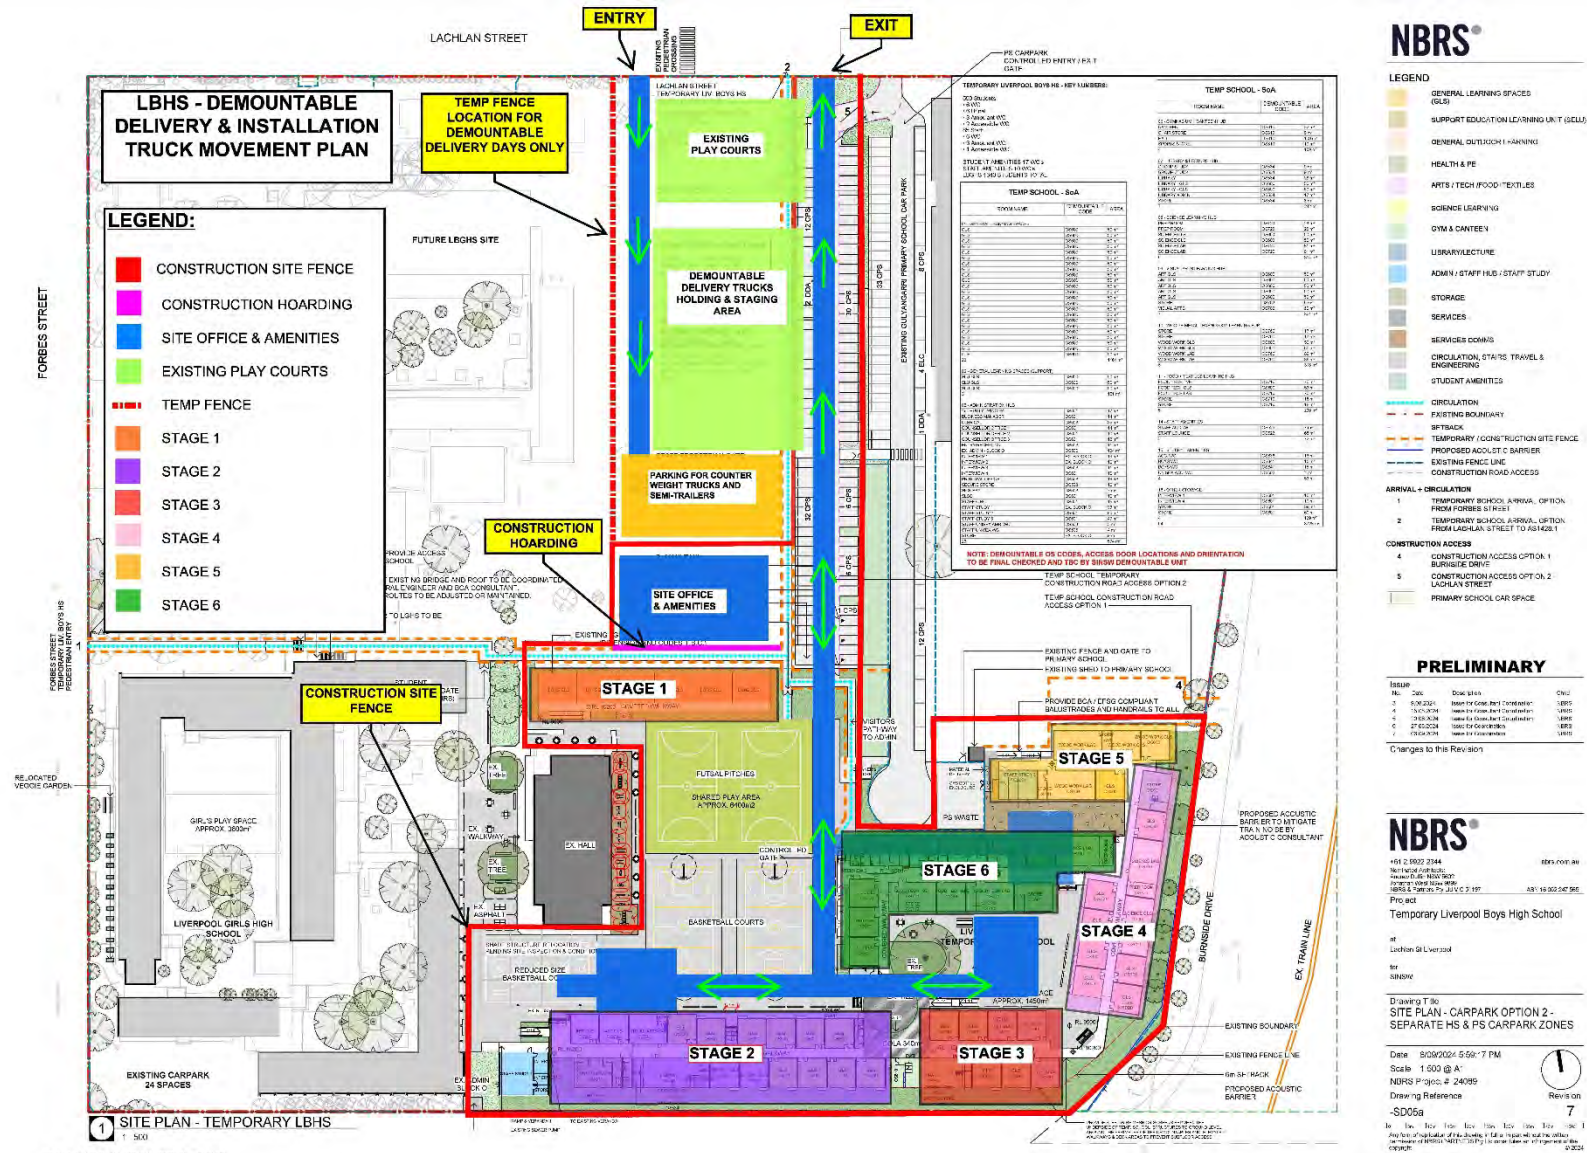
Demountable installation and truck movement plan (Source: Department of Education)
